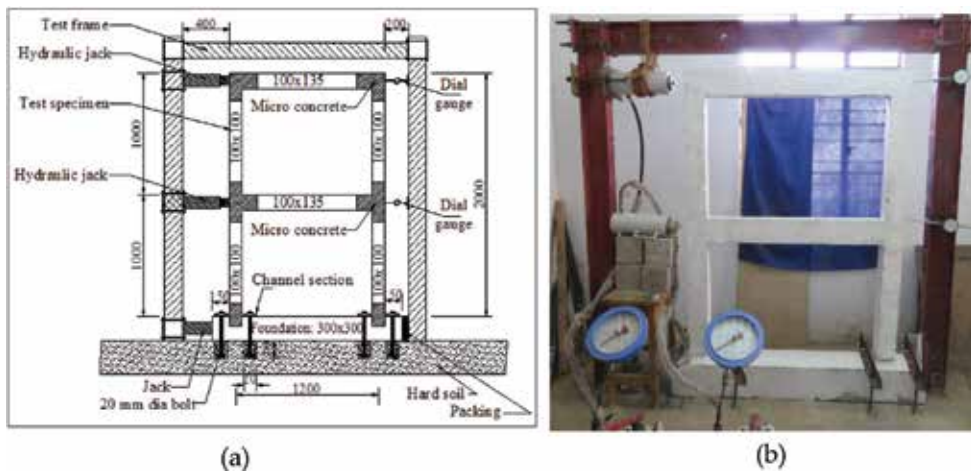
Testing of RC frame (a) test set-up (b) actual testing arrangement.
